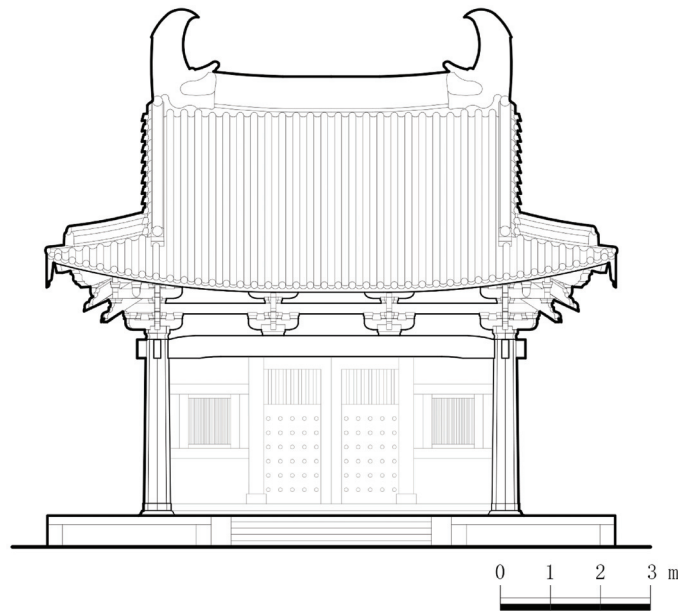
Front elevation of the main hall reconstruction. Drawing by authors.
